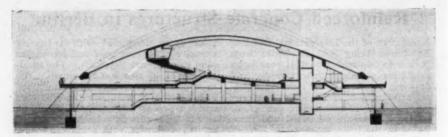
Longitudinal Section, Congress Hall, Berlin.
